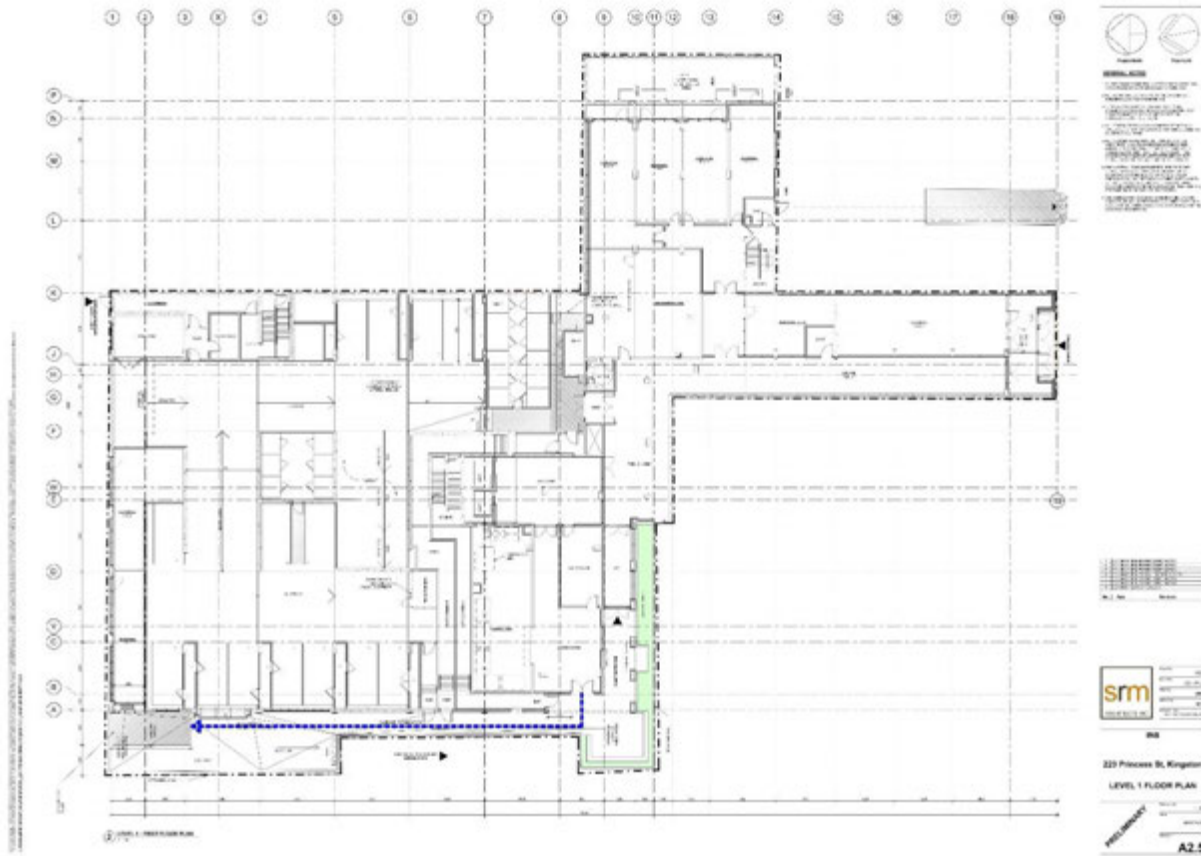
Level 1 Floor Plan of proposed development. Credit: SRM.
